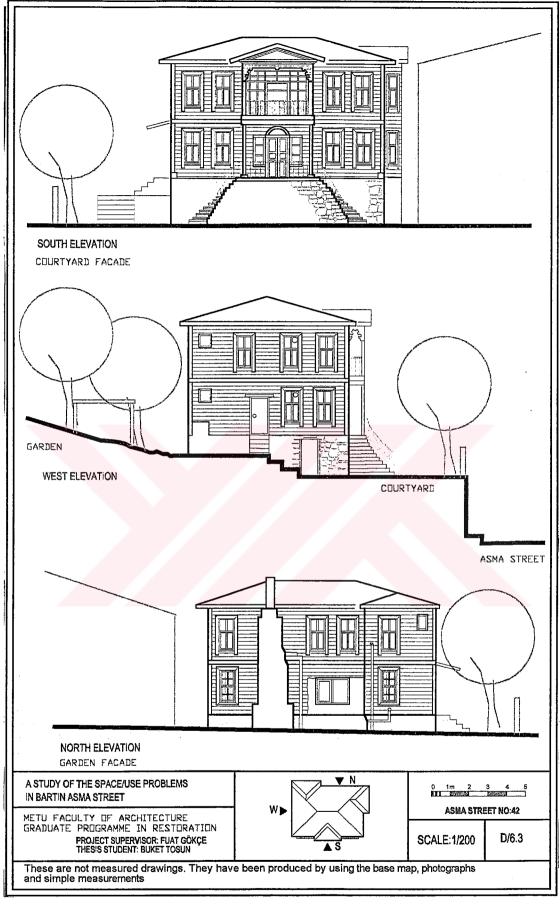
Sketch Drawings of Facades of the Building No:42
